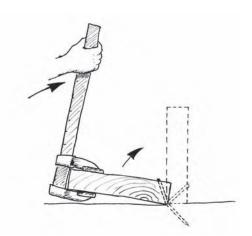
Angle nailing of the hanger to the ceiling joists
